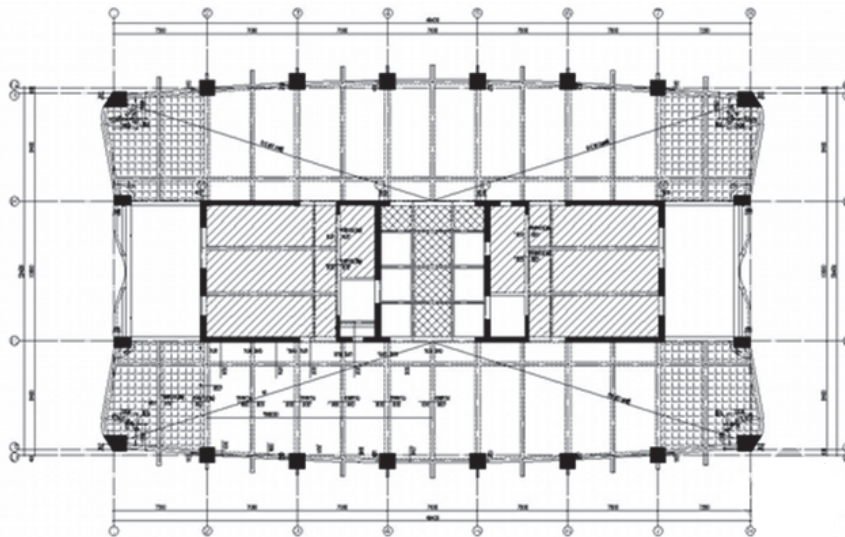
Reinforcement drawing of the 4th floor to the 20th floor of an office building.
